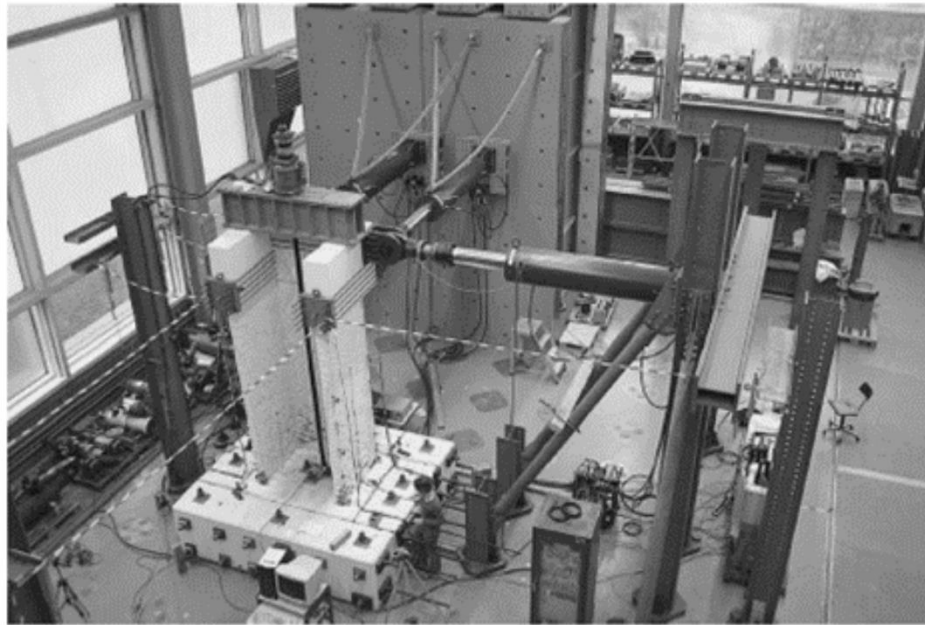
Experimental test set-up for C-shaped reinforced concrete core-wall (photo taken from Beyer et al. (2008))
